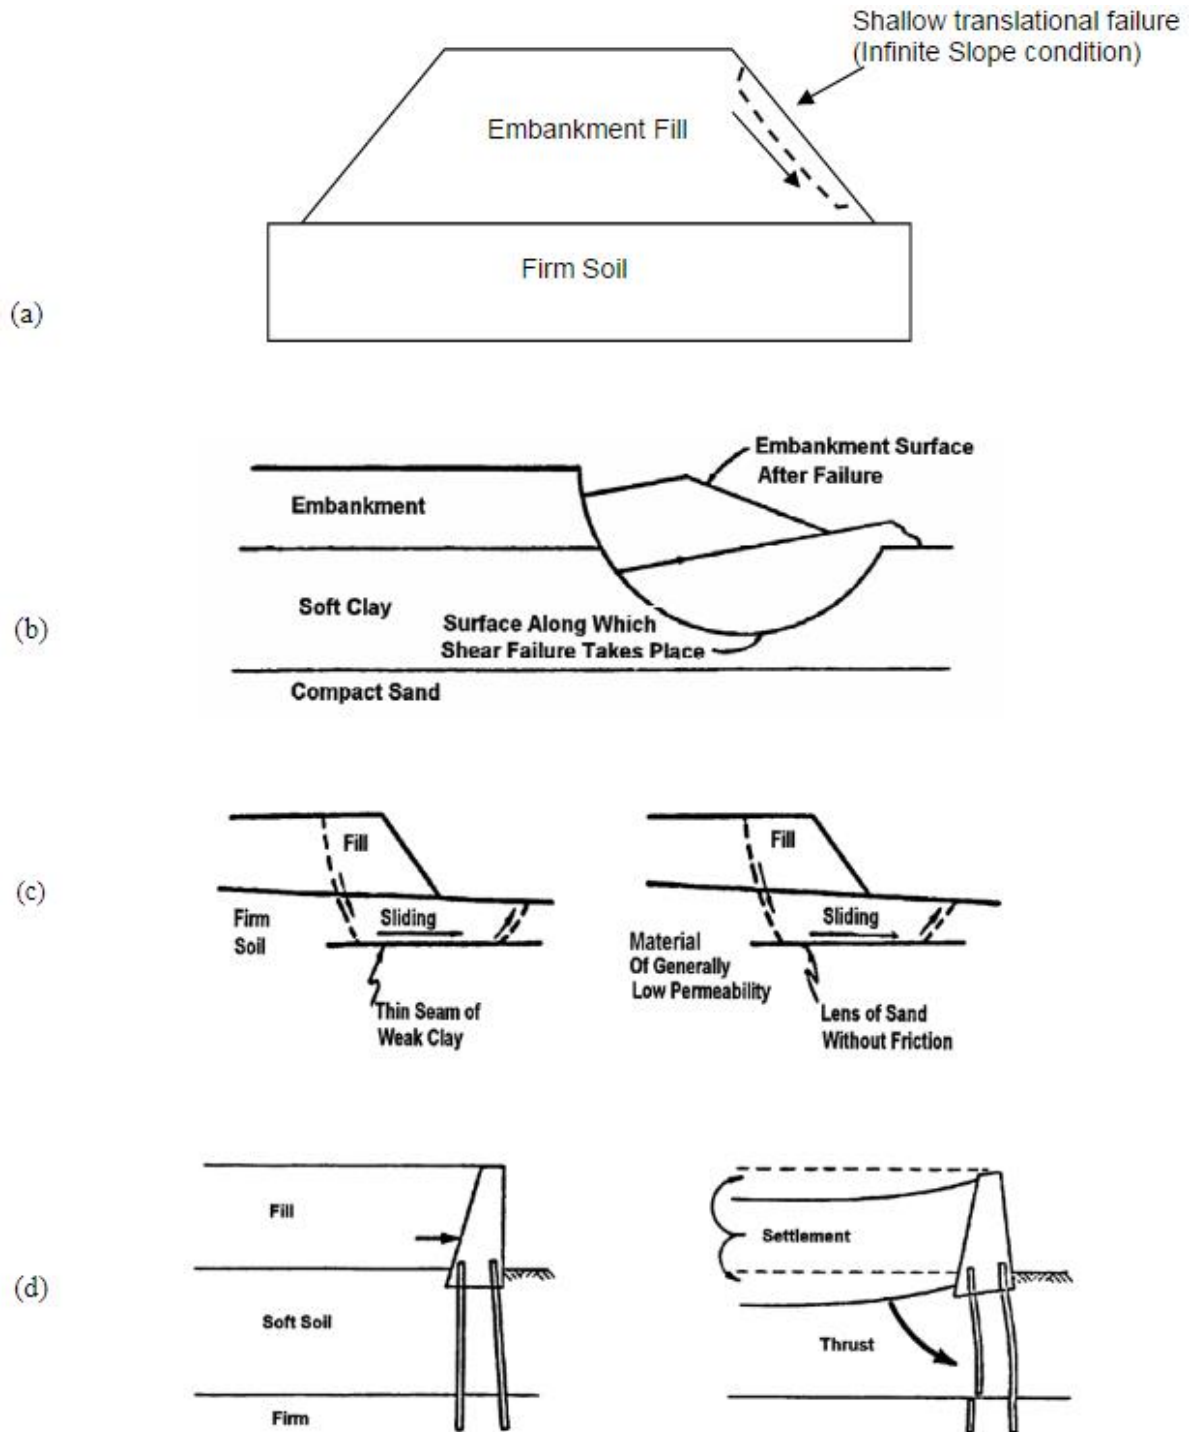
Earthworks failure mechanisms: (a) Shallow translational slope failure in embankment fill; (b) rotational failure in embankment fill and foundation soil; (c) sliding block failure; (d) settlement of foundation soil (image from FHWA, 2001)
